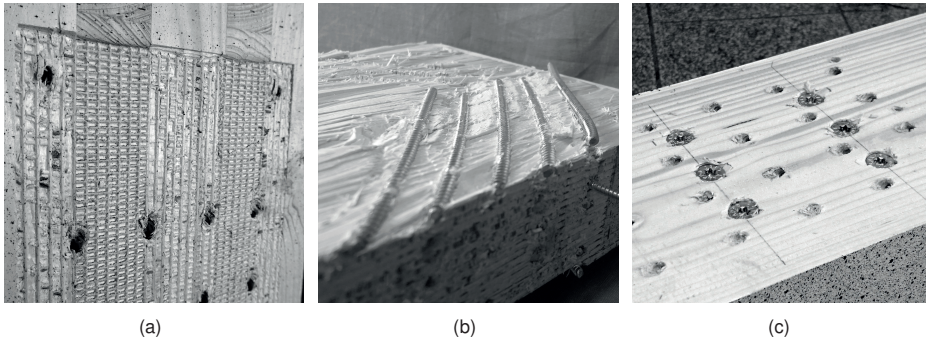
Specimens with prototype v3 after tests: (a) impression of pyramid pattern in CLT; (b) bending of screws; (c) screws for compressive reinforcement perpendicular to grain.
